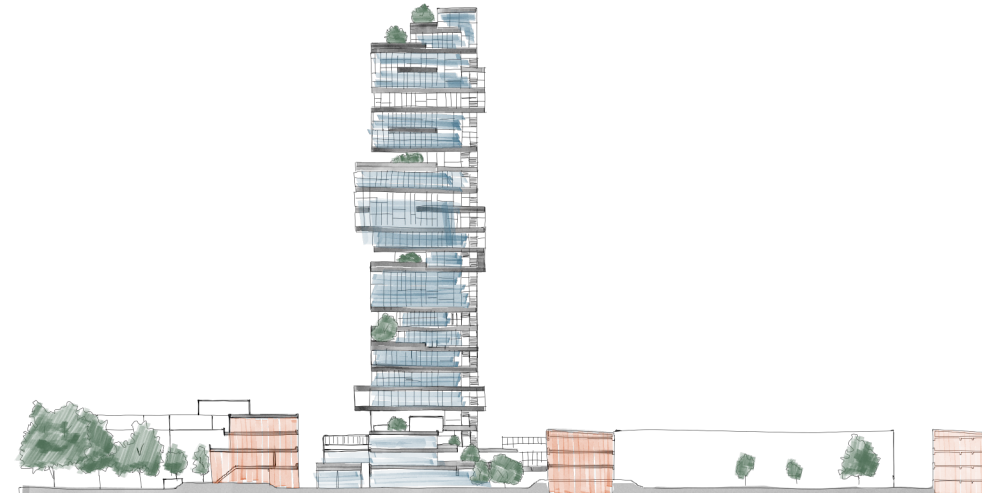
Sketches showing the elevation of the tower and the buildings along the pedestrian corridor.
